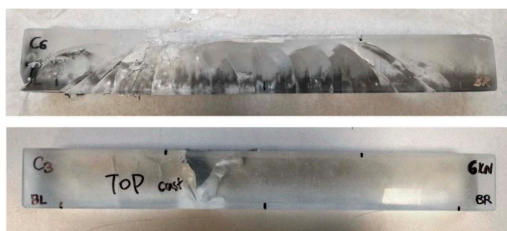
Side view of the Kovar-reinforced alkali borosilicate beam (top) and a soda borosilicate beam (bottom). The reinforced beam shows progressive failure and multiple cracks, yet although heavily damaged, still exhibits post-failure load-bearing capacity. The unreinforced beam (bottom) fails in a sudden manner (in this case at 6kN), with a transverse, branching crack that splits the beam into 3 separate components of no post-fracture loading capacity.
